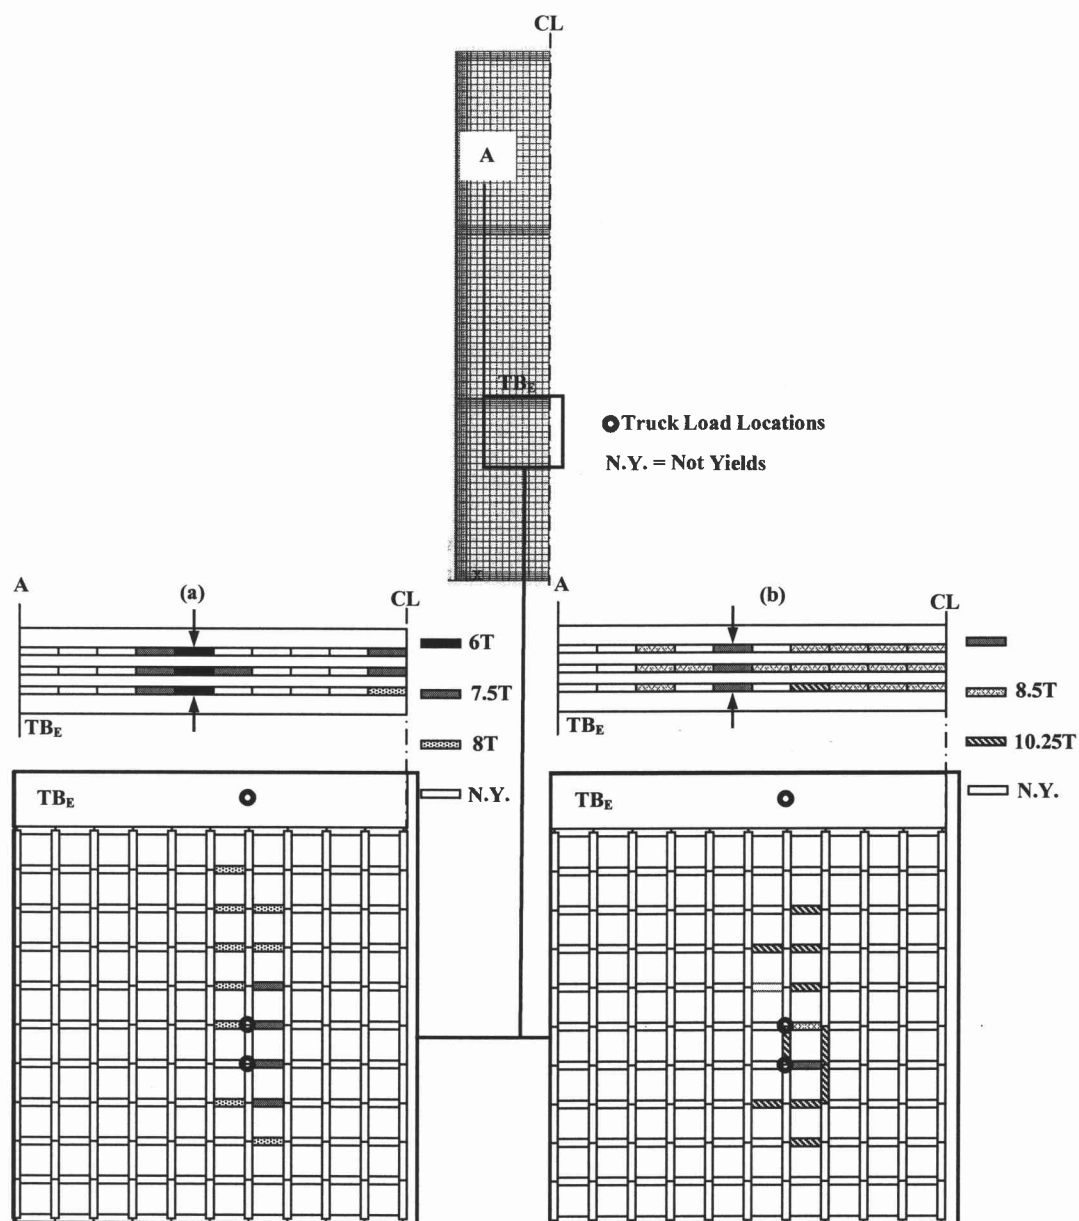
Yielding in Reinforcing Steel (Scaled Truck Loading): (a) Unstrengthened Bridge; (b) FRP-Strengthened Bridge
